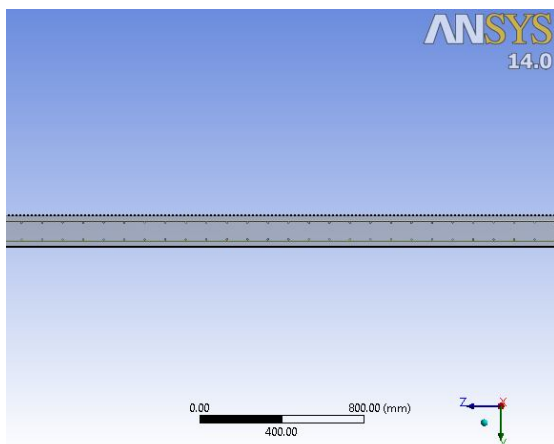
Arrangement of bars in bubble deck slab (side view)
